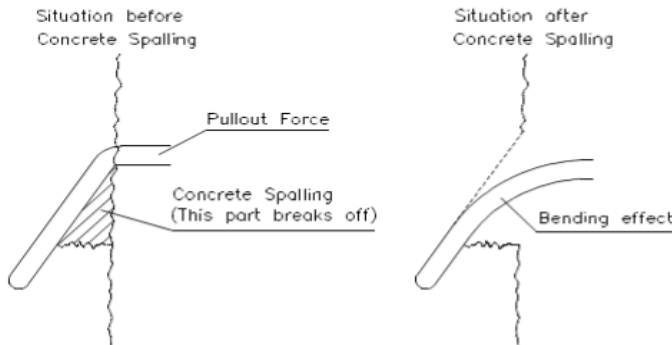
Concrete spalling [15, Figure 2-5]
